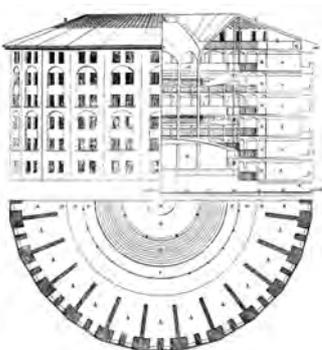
(Left) Jeremy Bentham's panopticon prison design. Elevation, section, plan. (www.wikipedia.com)
